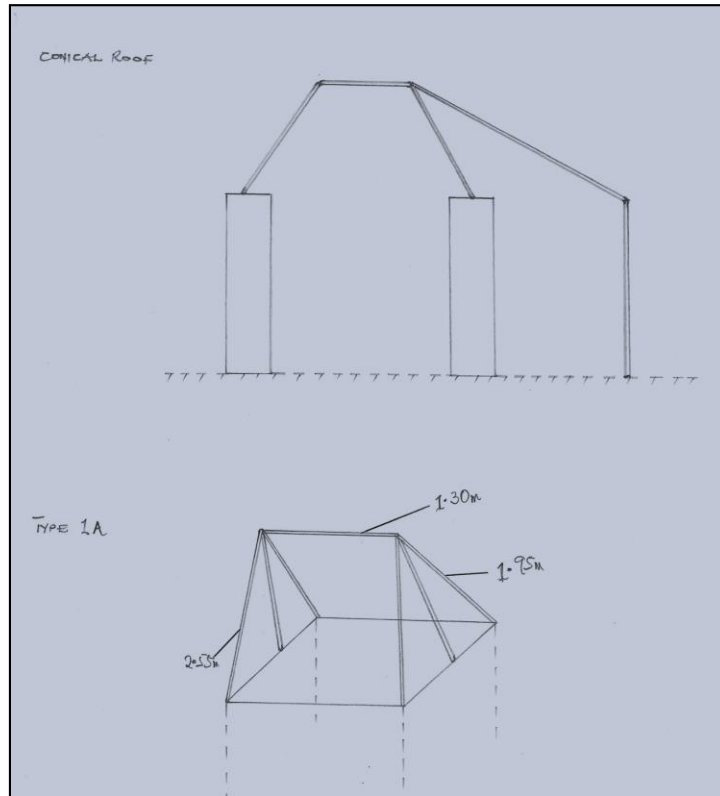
Type 1A – Roofing framework for conical roof style (Drawing by Author and M. Ameny-Xa)
